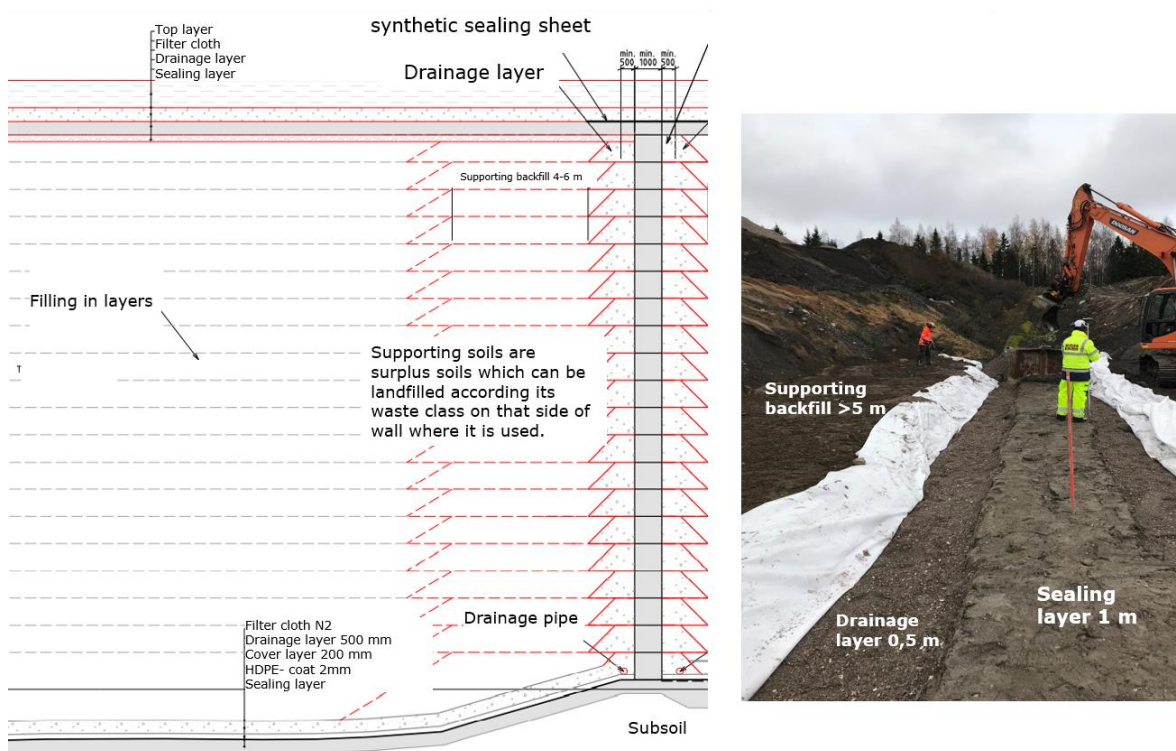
Kuopio’s vertical sealing barrier’s cross-section cut and layers of structure.
